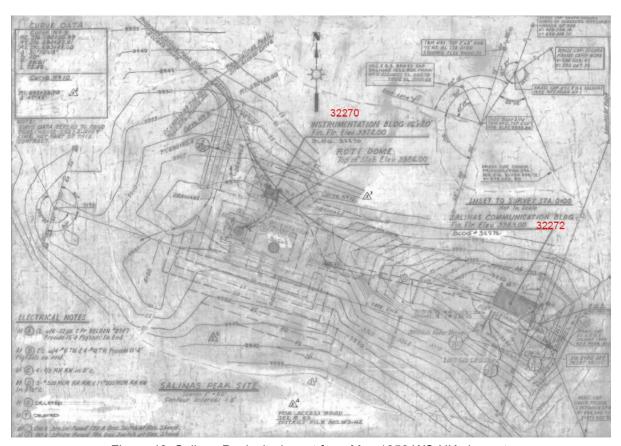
Salinas Peak site layout from May 1958 WS-HK plan set.
